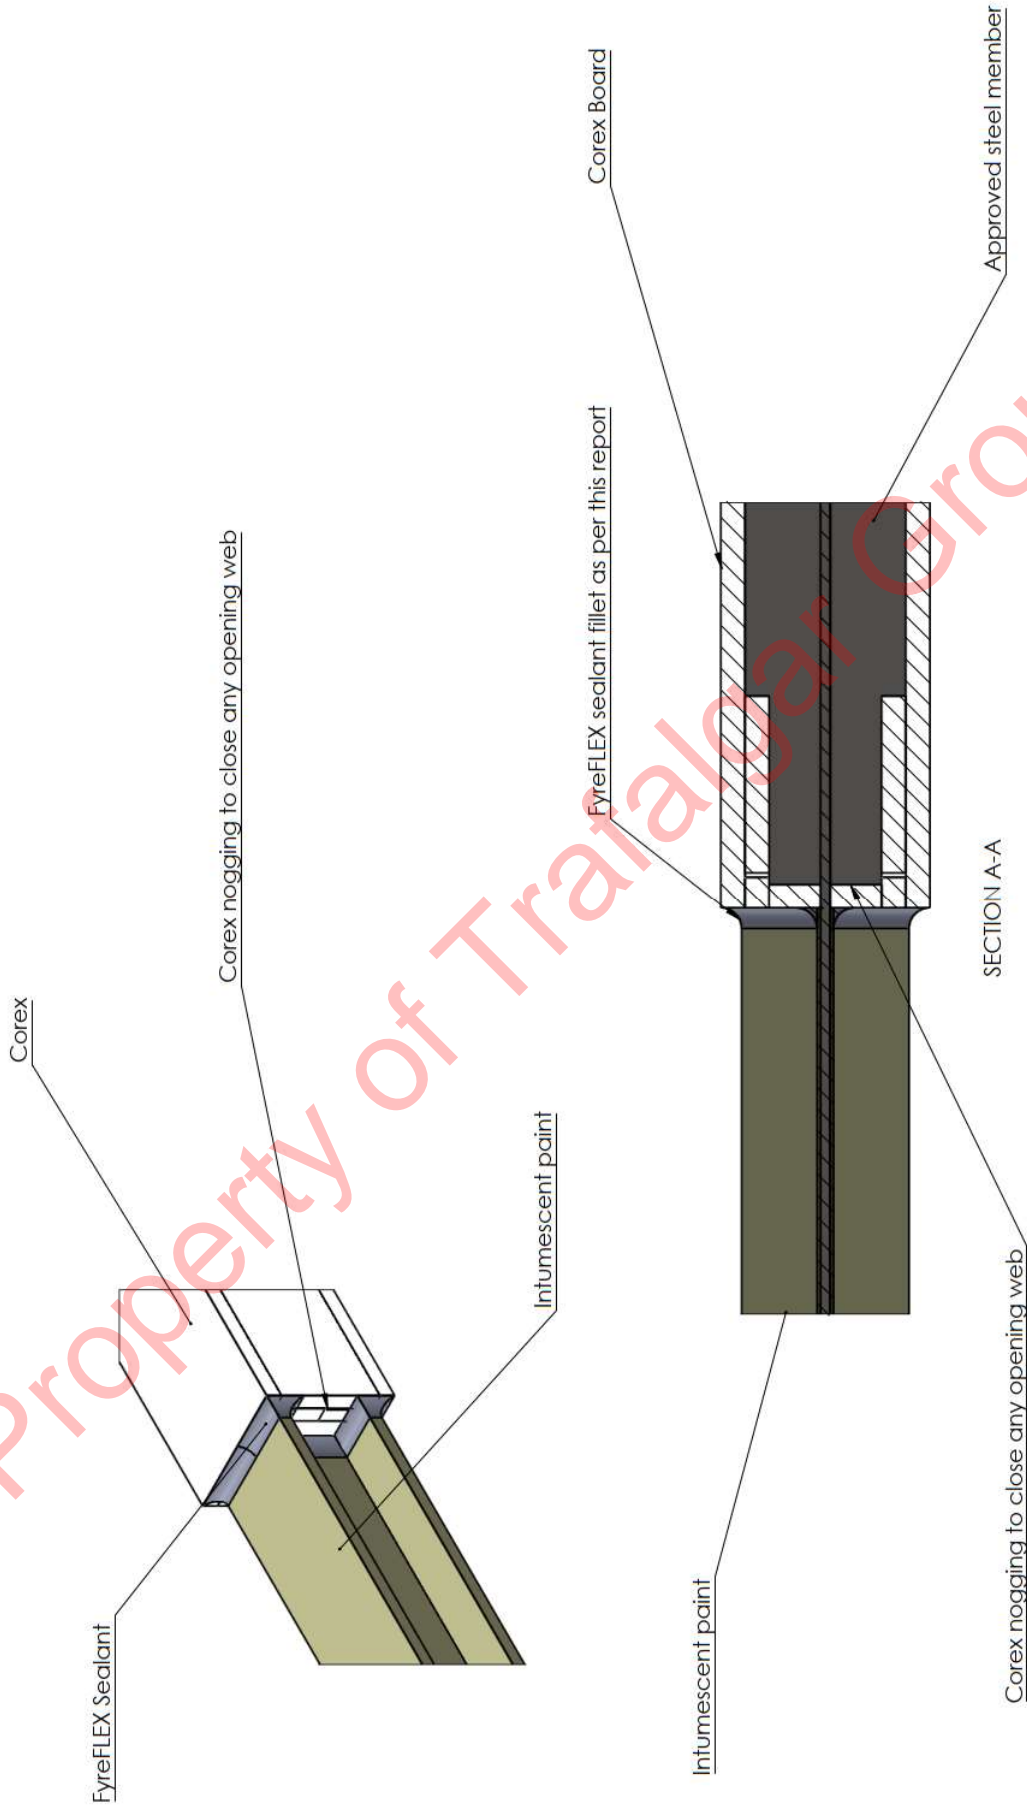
The construction detail when the board protection system is added next to the existing intumescent paint protection system
